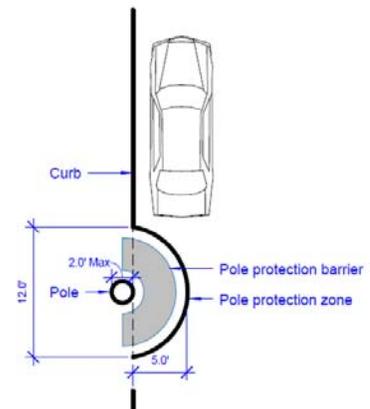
Plan Detail of PRT Pole in Curb Extension
